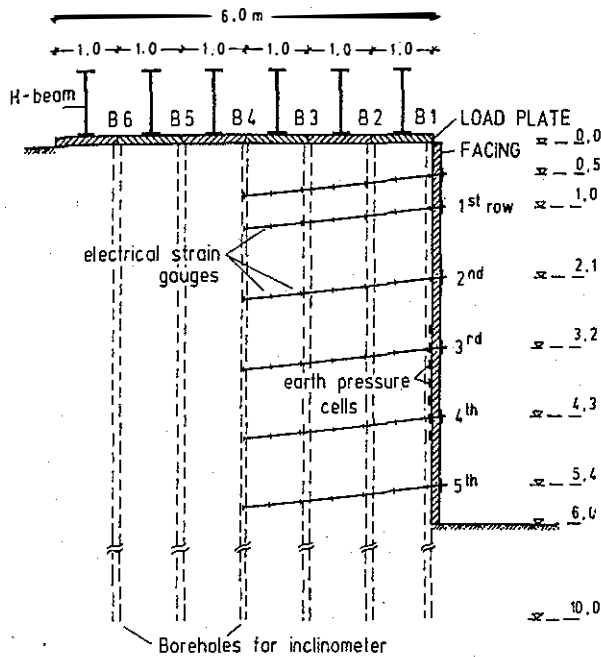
Cross-section of the test wall with loading facility and instrumentation
